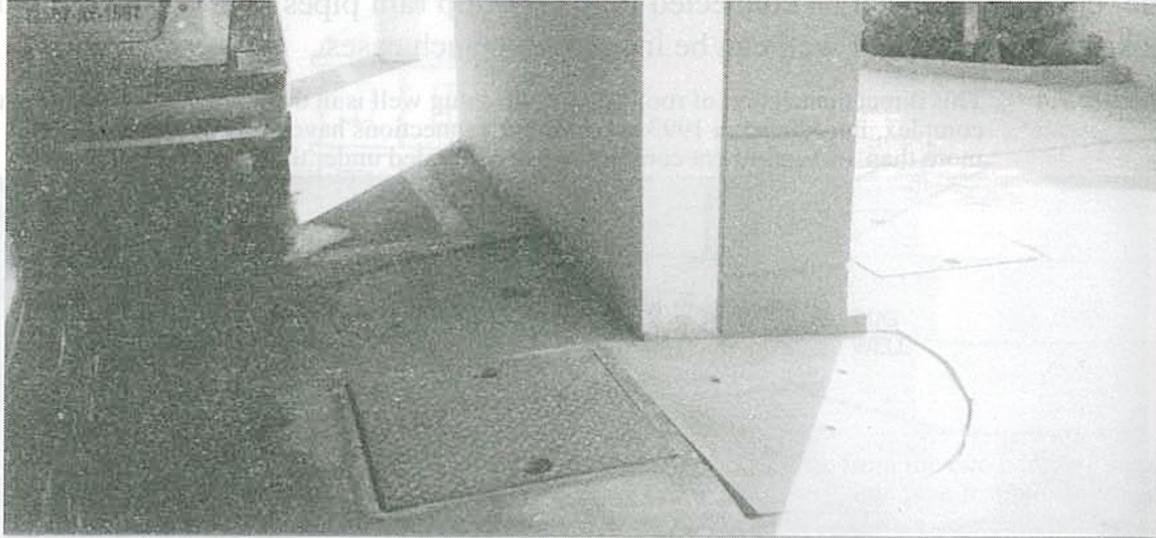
This direct connection of rooftop pipes to a dug well is in the author's own apartment complex, introduced in 1993. Such direct connections have thereafter been made in more than 150 apartment complexes but concealed under the ground.
